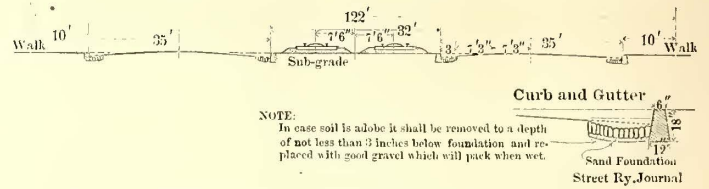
CROSS SECTION OF TRACK ON BOULEVARD, SAN MARENO AND LAMANDA PARK EXTENSIONS
